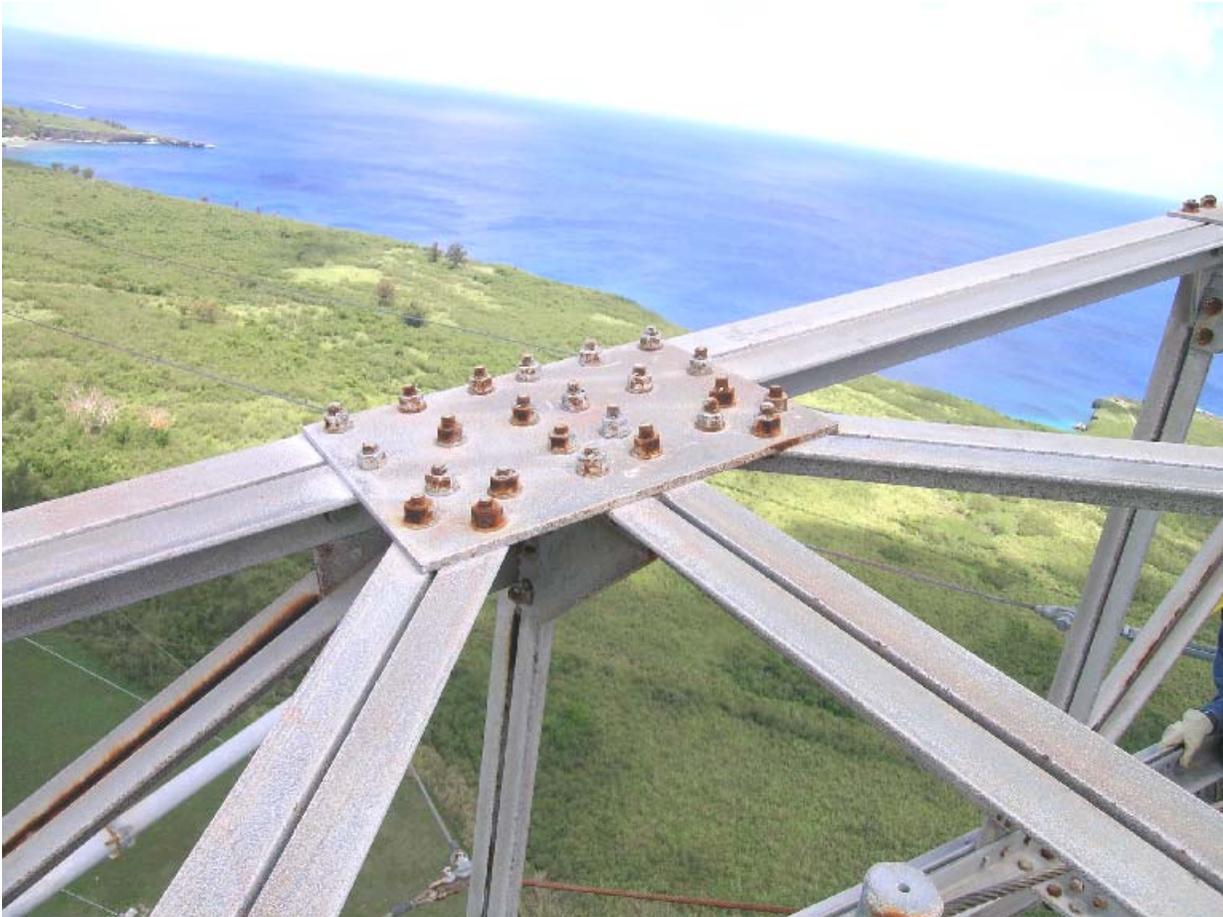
, Corroded Structural Fasteners on Outrigger Structures, Tinian Site
